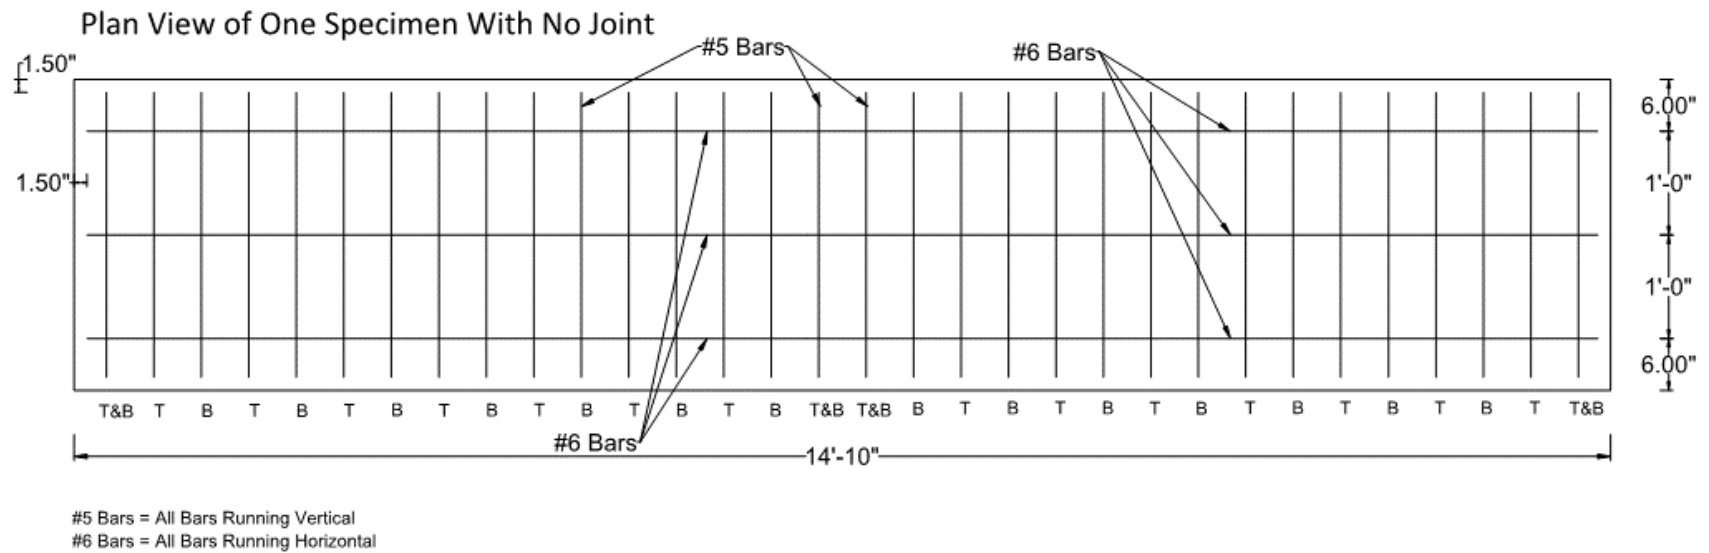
Reinforcing Steel Layout of Jointless Specimen
